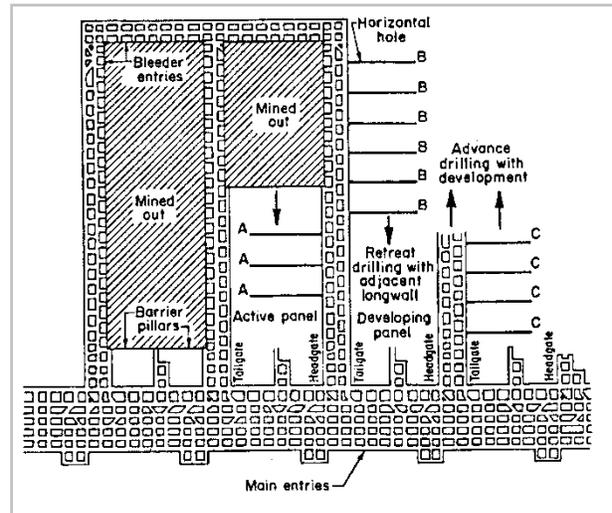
In-Seam Boreholes drilled across Longwall Panels during Gateroad development
